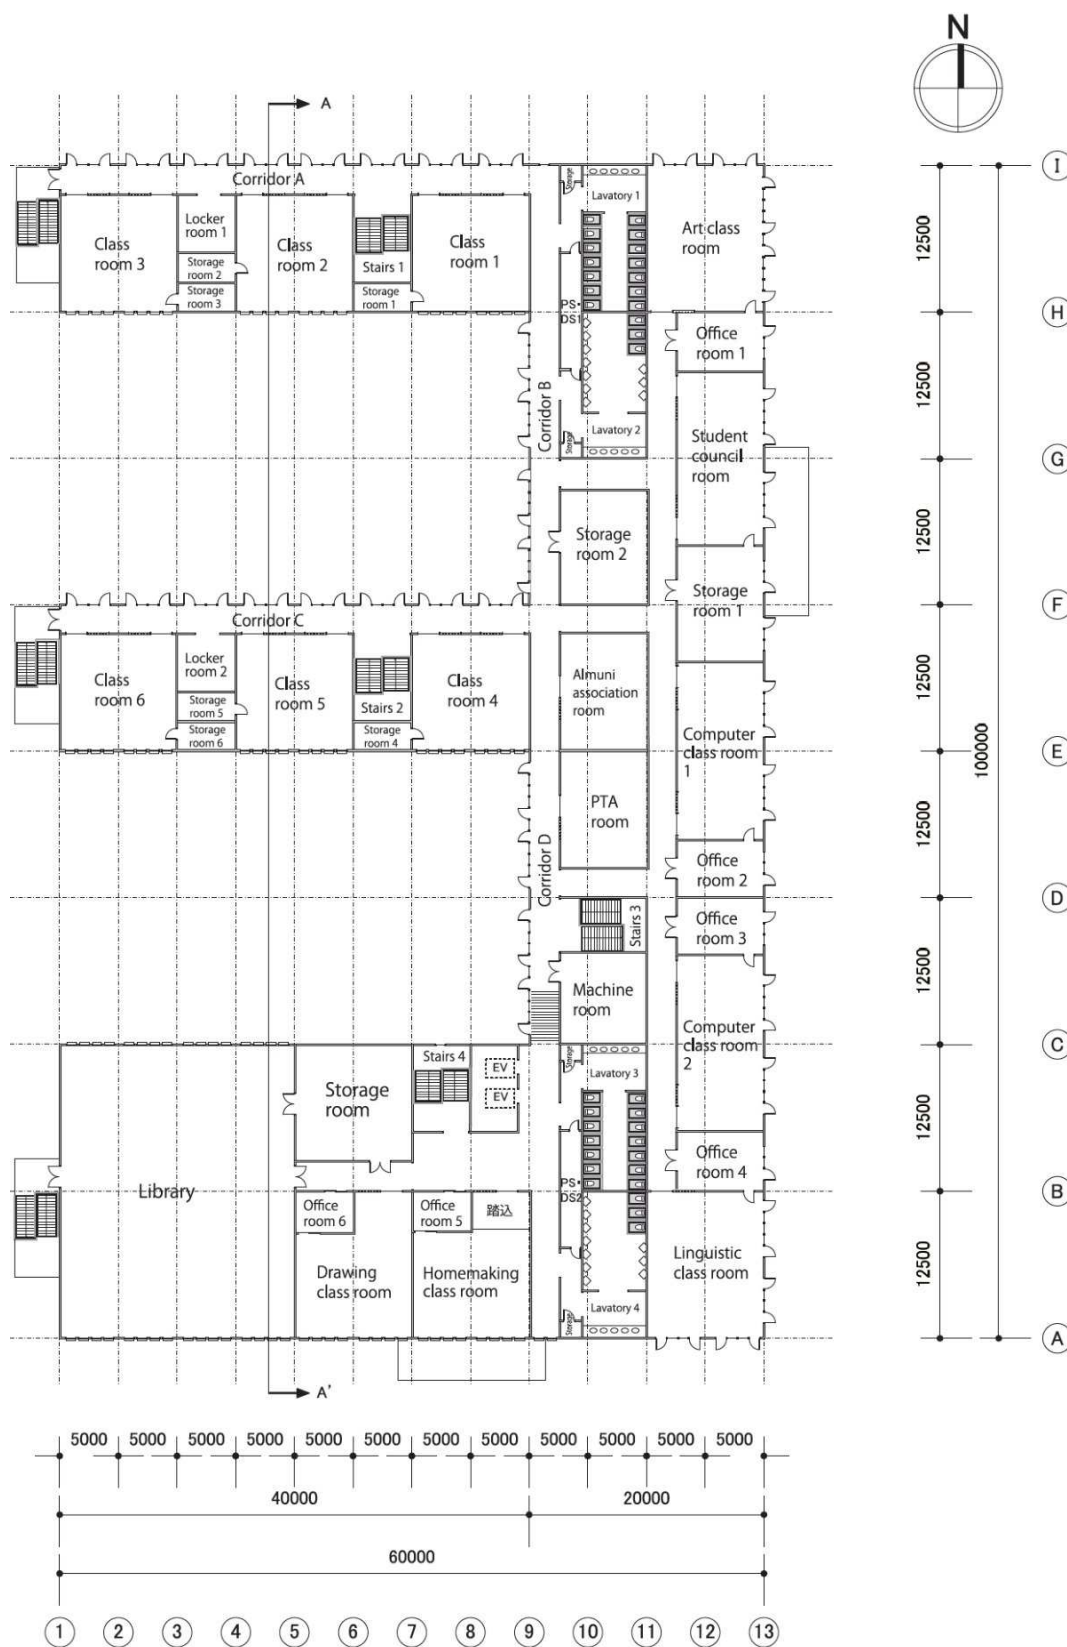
Model building (school, 10 000 m²) plan, first floor (second floor)
